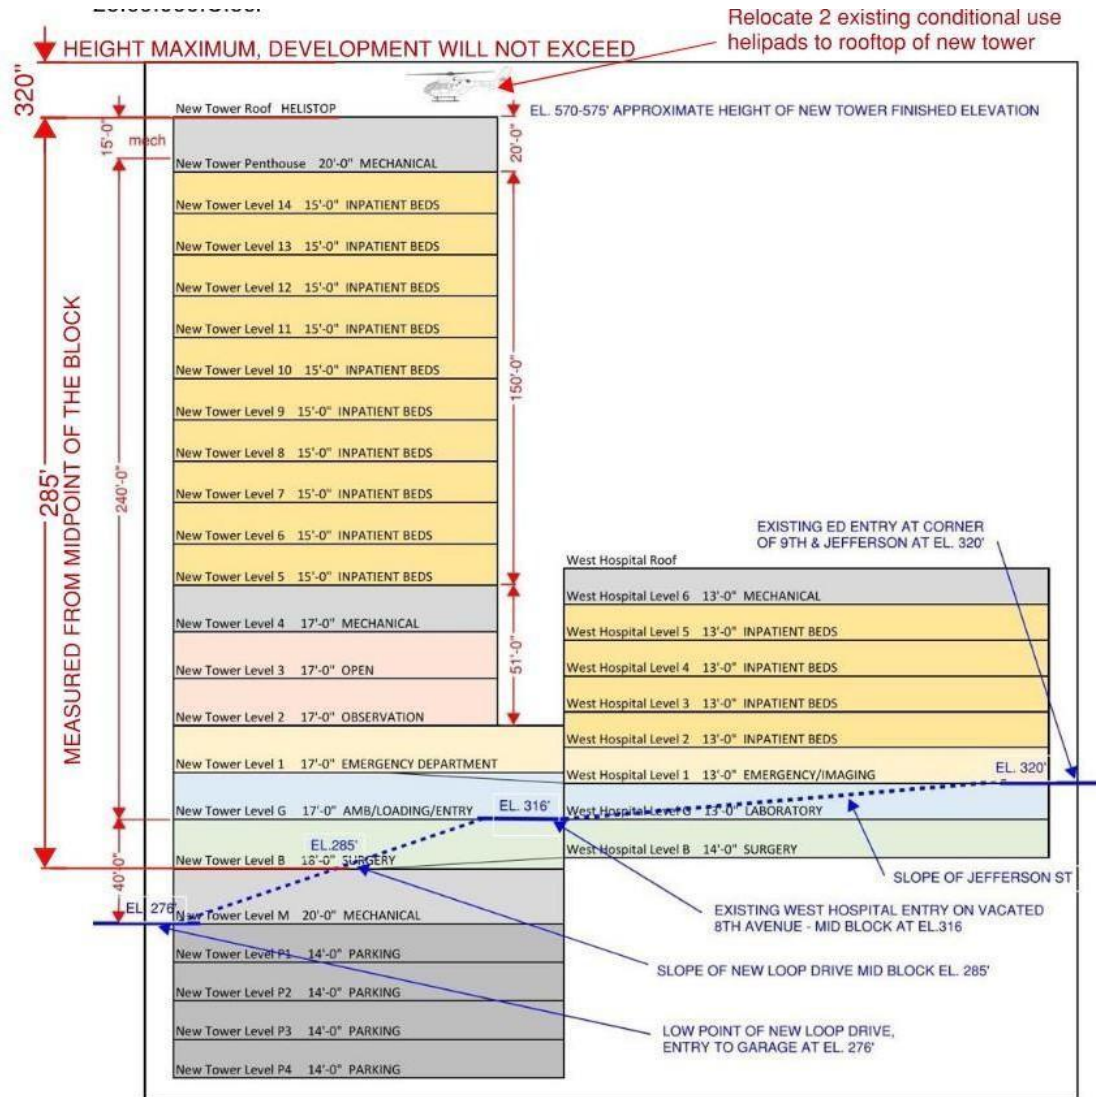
CROSS SECTION OF HEIGHT MEASUREMENT FOR PLANNED NEW PATIENT TOWER
